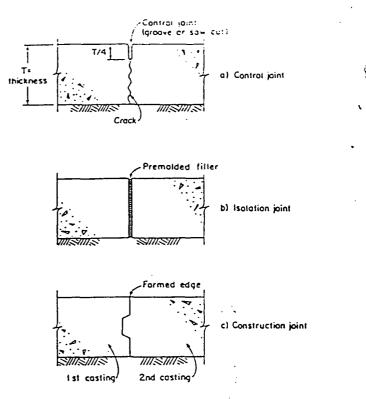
The three basic types of joints used in concrete slab-on-ground construction.
